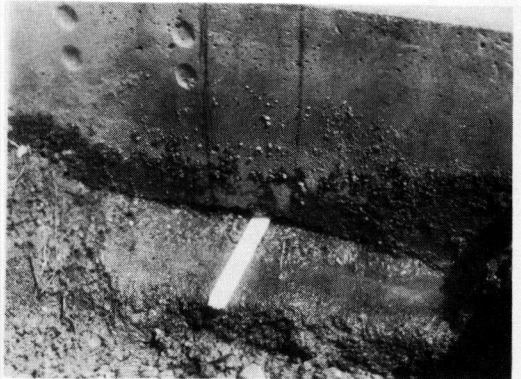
Station 1221+37 of Project F-130(8). Rule placed in opening beneath pavement at location of edge-blow. Note free water flowing from under pavement.
